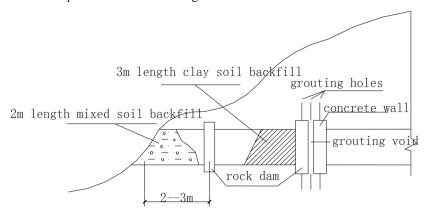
Cross-section of sealing adits and inclined shaft with drainage.
